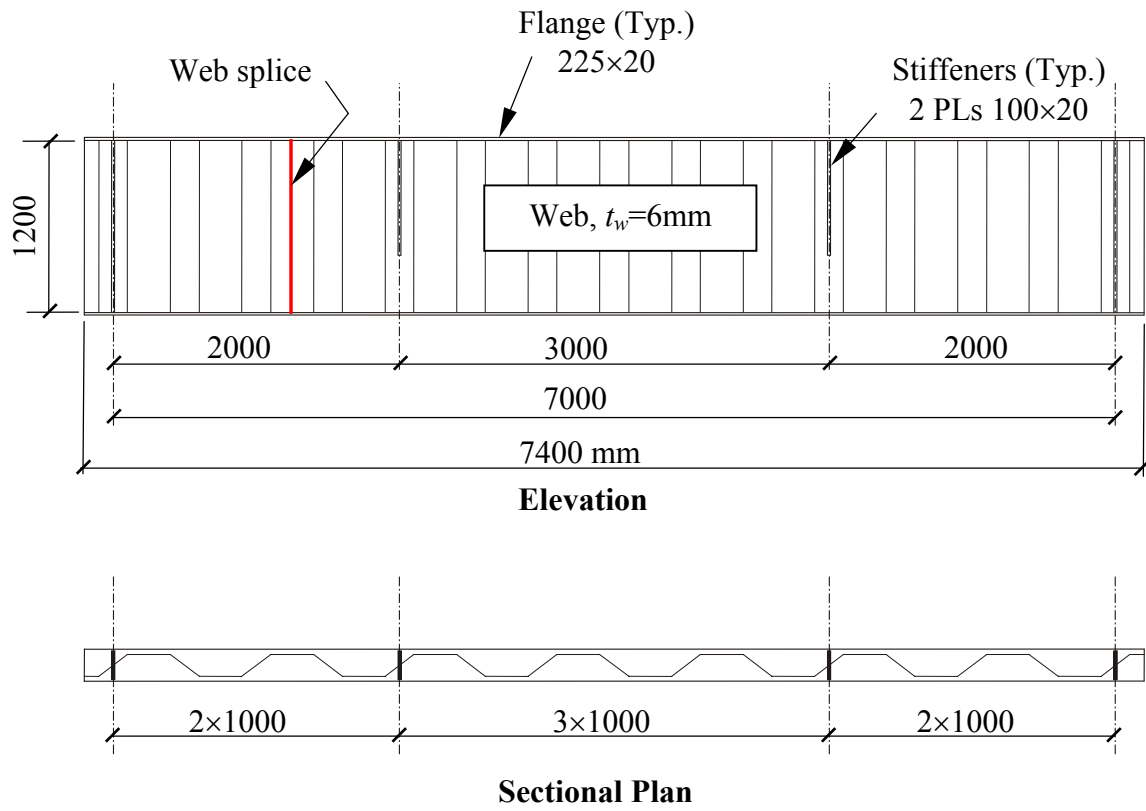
Fatigue test specimens (Girders G1A to G6A).
